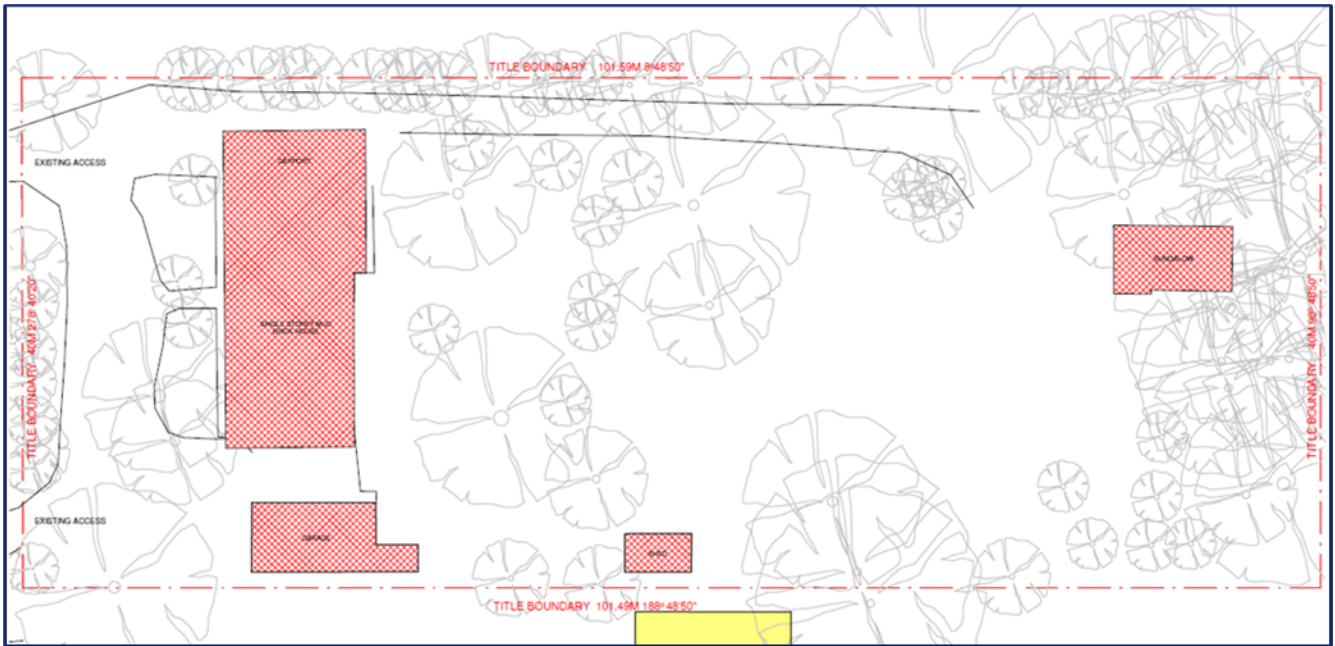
Existing Site Layout Plan showing structures to be removed or demolished
